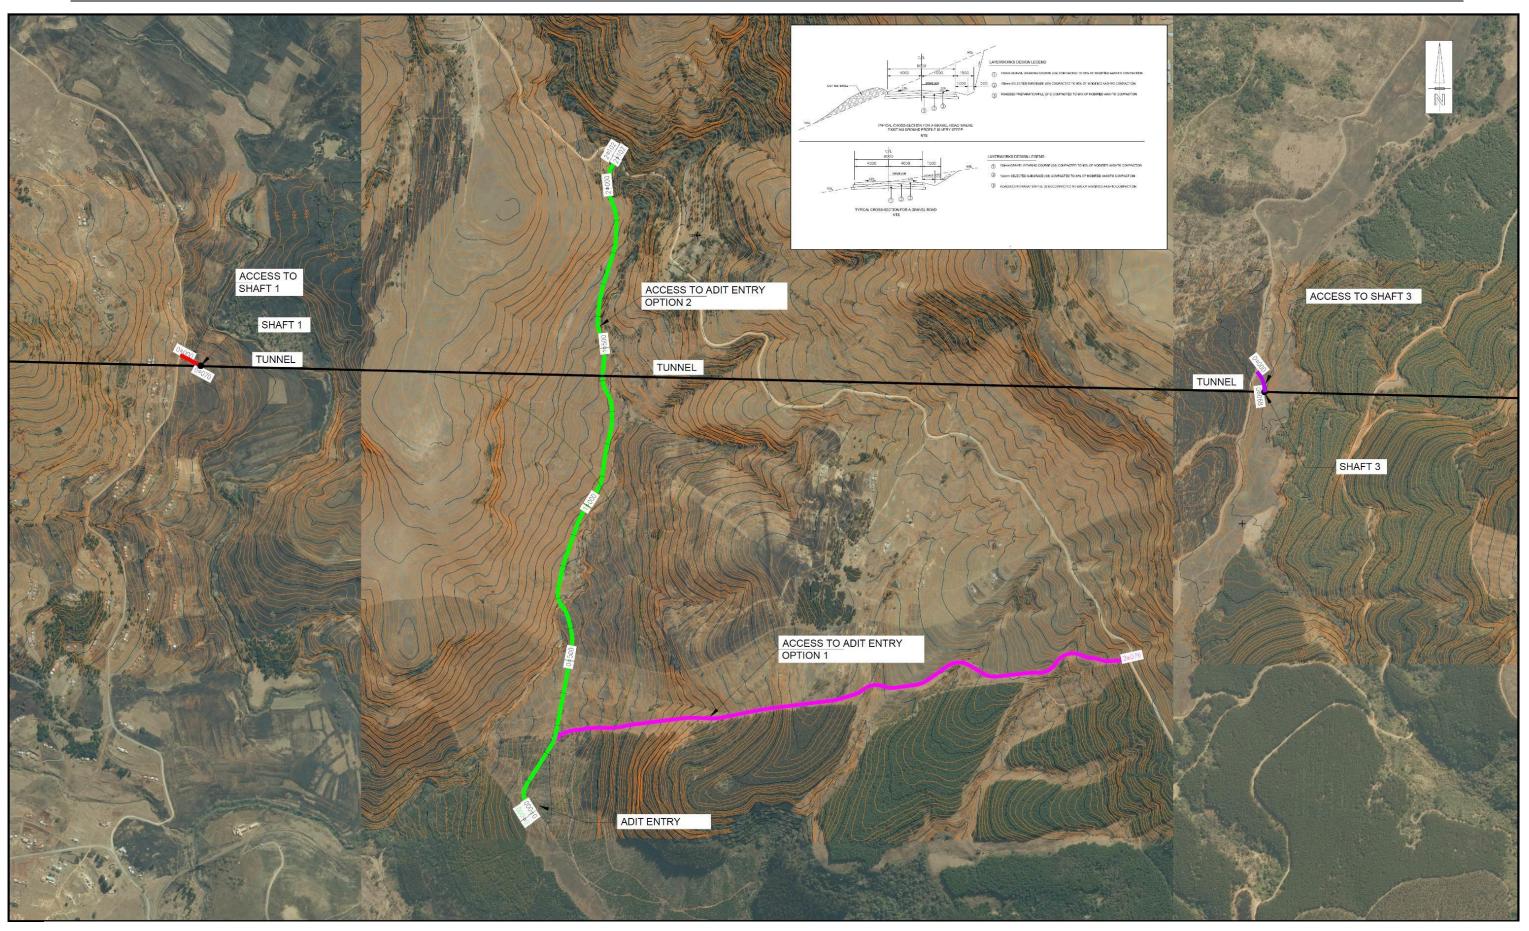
Transfer tunnel – Layout of access roads to shaft 1, adit entry and shaft 3
